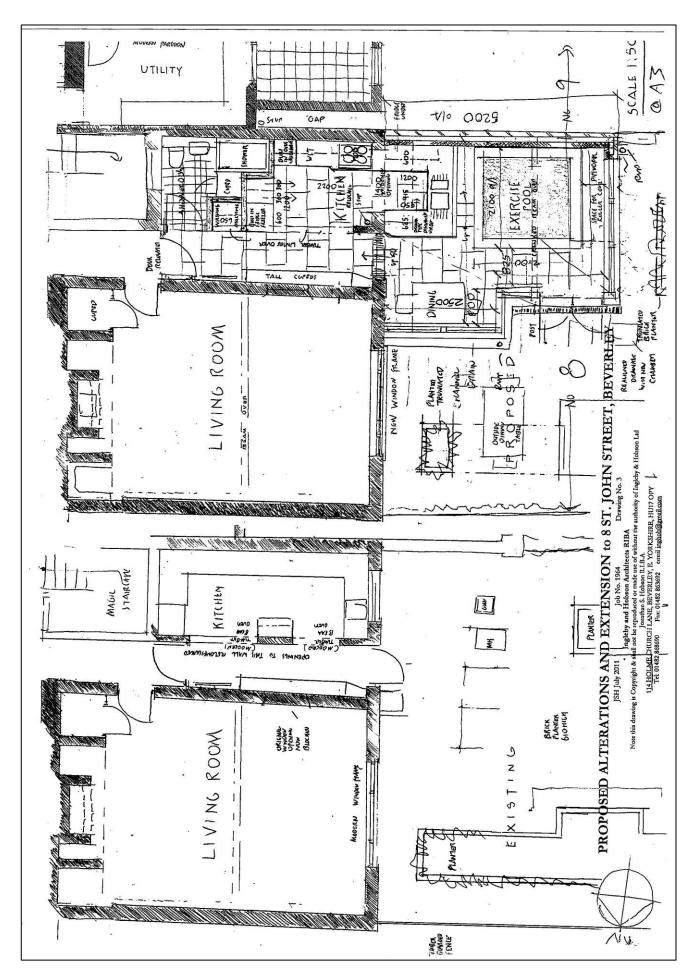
EXISTING AND PROPOSED GROUND FLOOR PLANS (not to scale - drawing supplied by Ingleby & Hobson)
